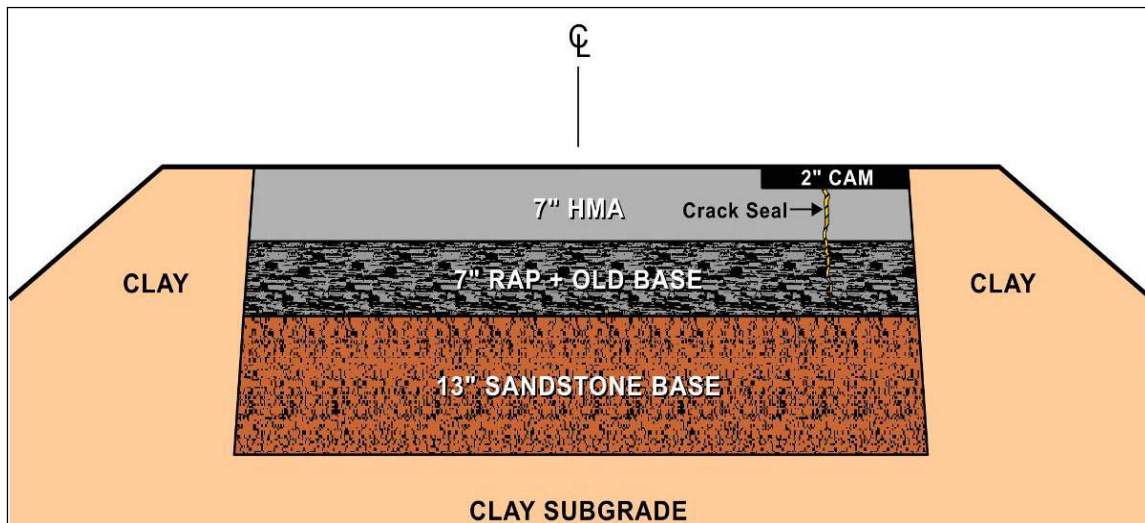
CAM for Repairing Non-Faulted Locations of Longitudinal Cracking.
